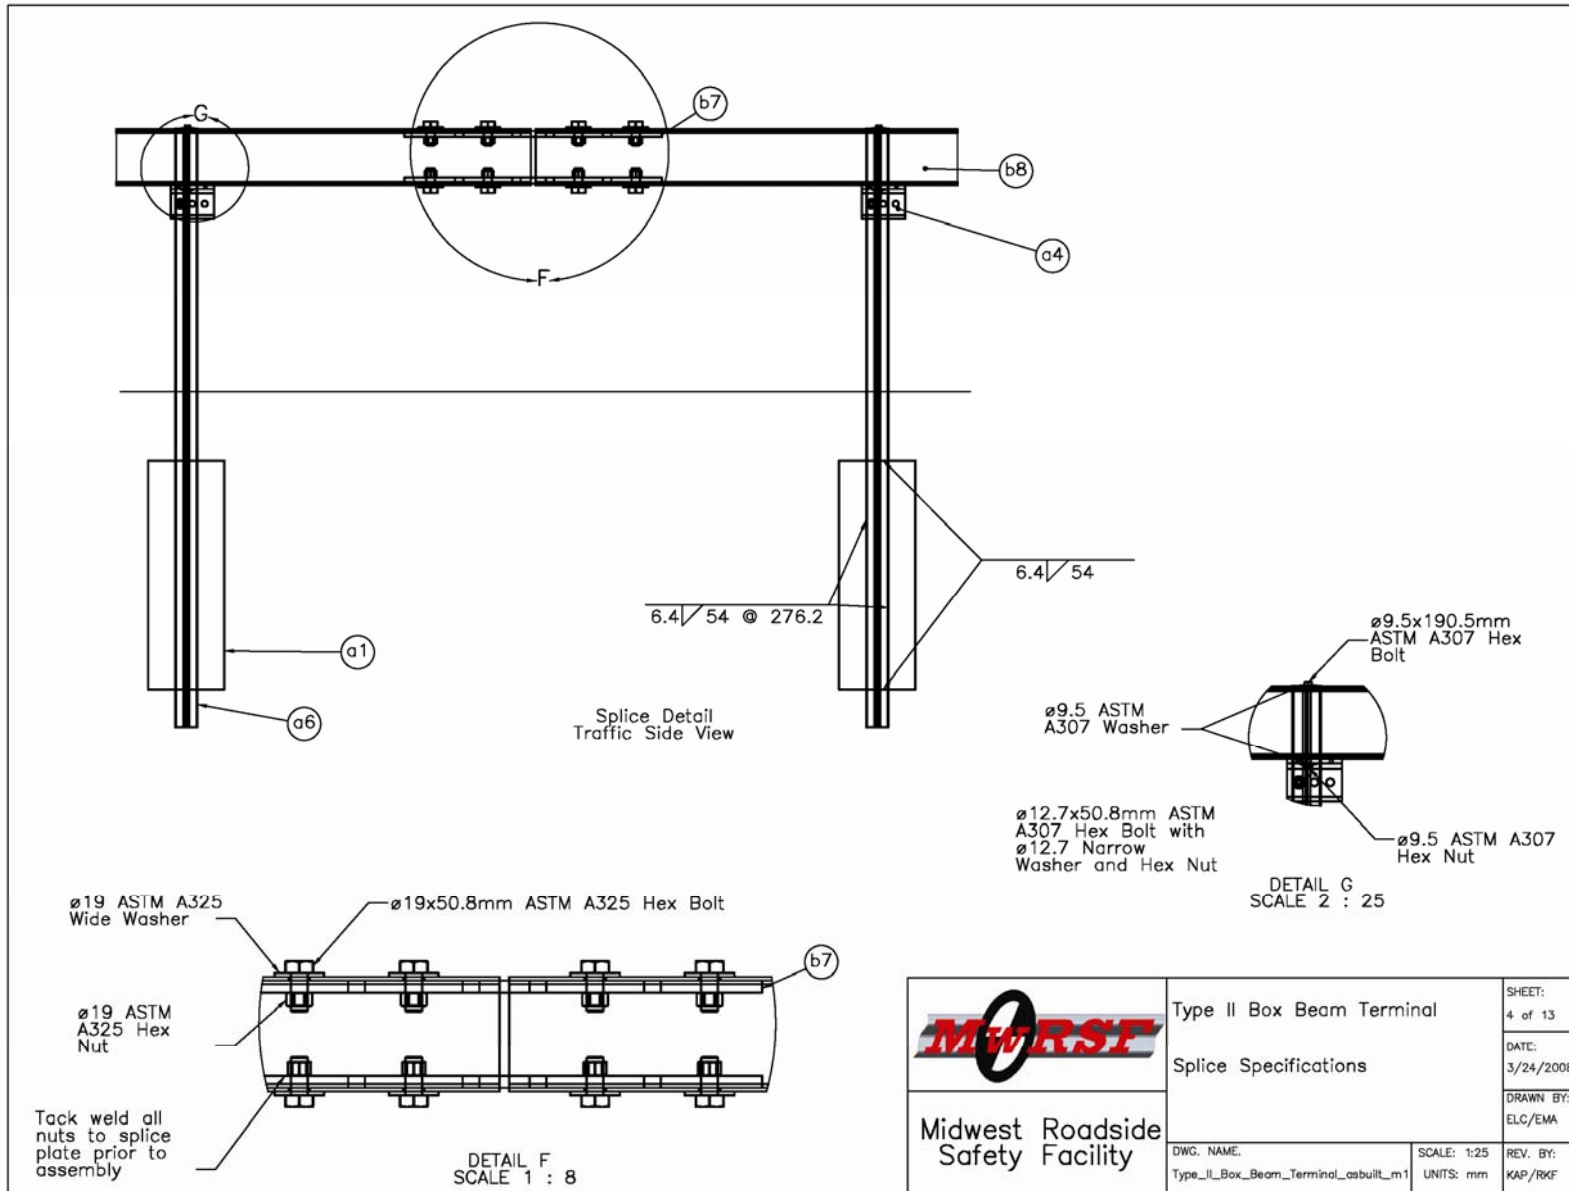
Type II Box Beam System Details, Test No. NYBBT-1
